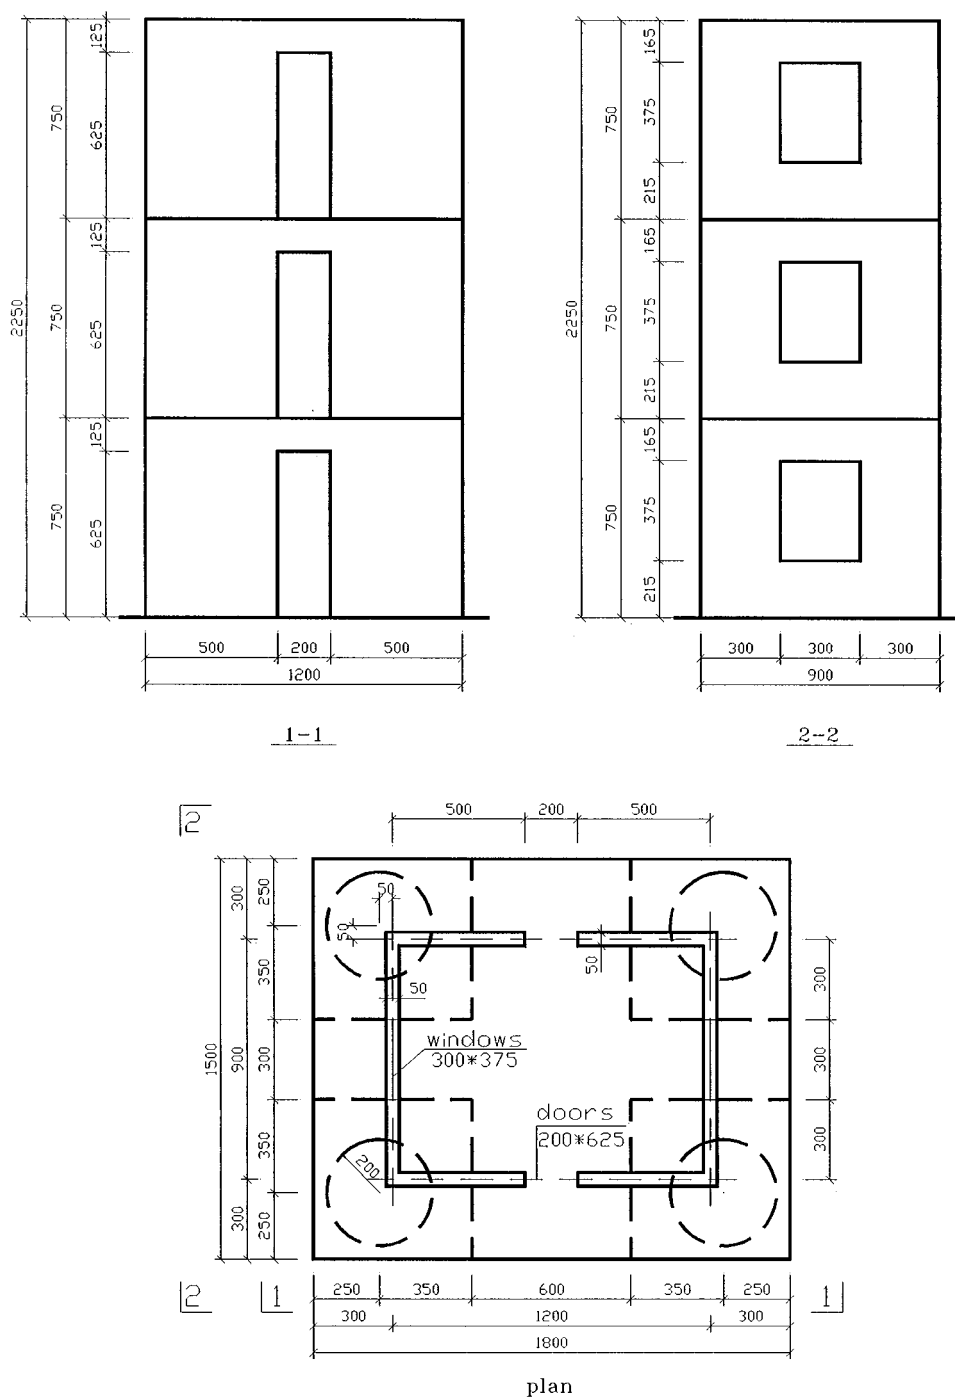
Details of the brick masonry model (Note: all dimensions in mm)
